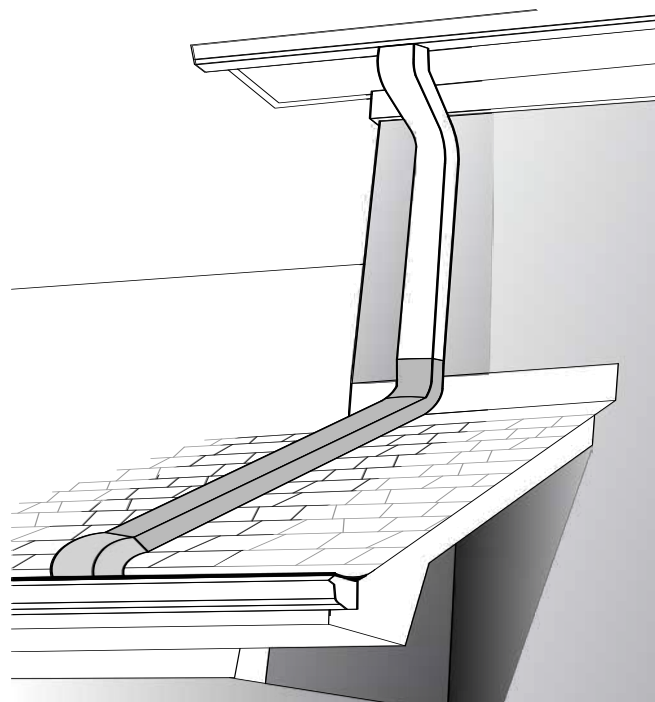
Channeling Runoff to a Gutter With a Downspout Extension
